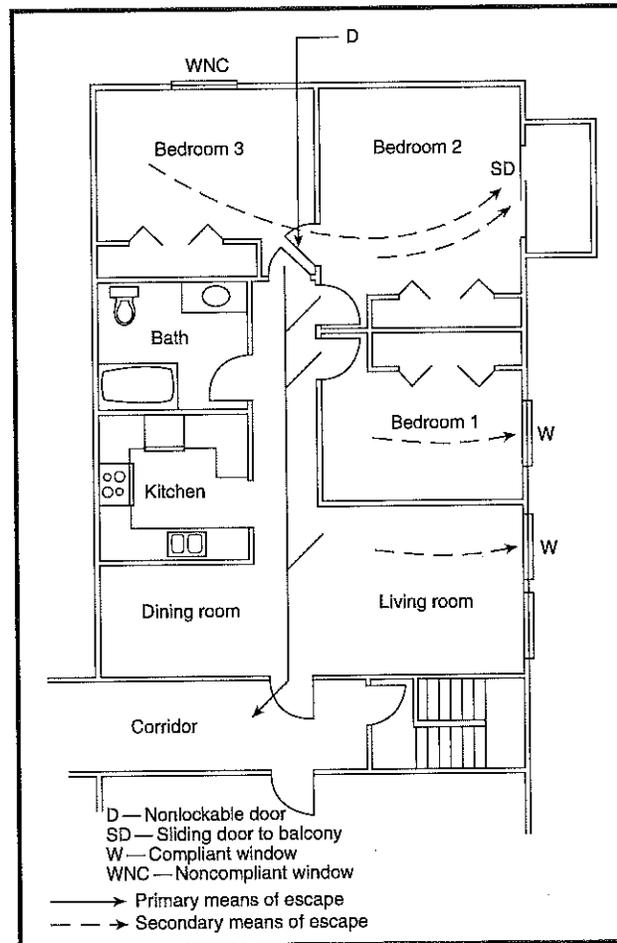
Alternative secondary means of escape arrangement complying with 24.2.2.
